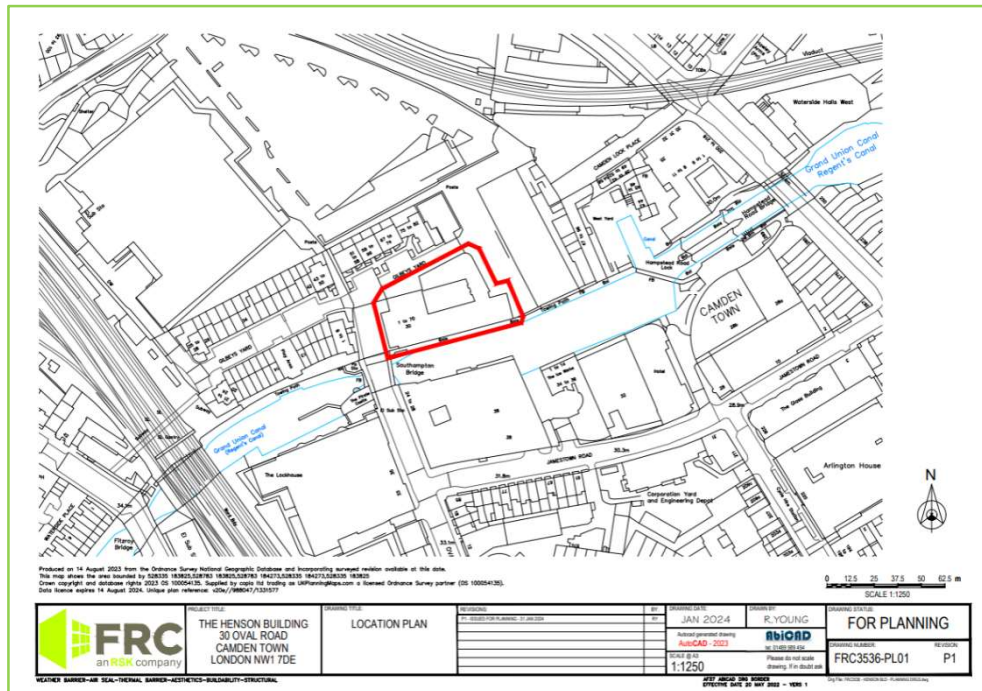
Red outline denotes the full extent of the site forming The Henson Building
